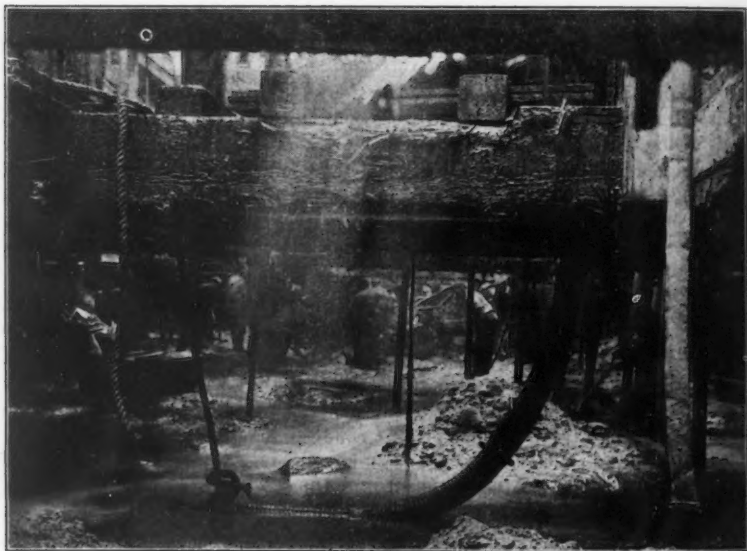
COFFER-DAM UNWATERED, NORTH MAIN PIER OF NEW RAILROAD BRIDGE.
